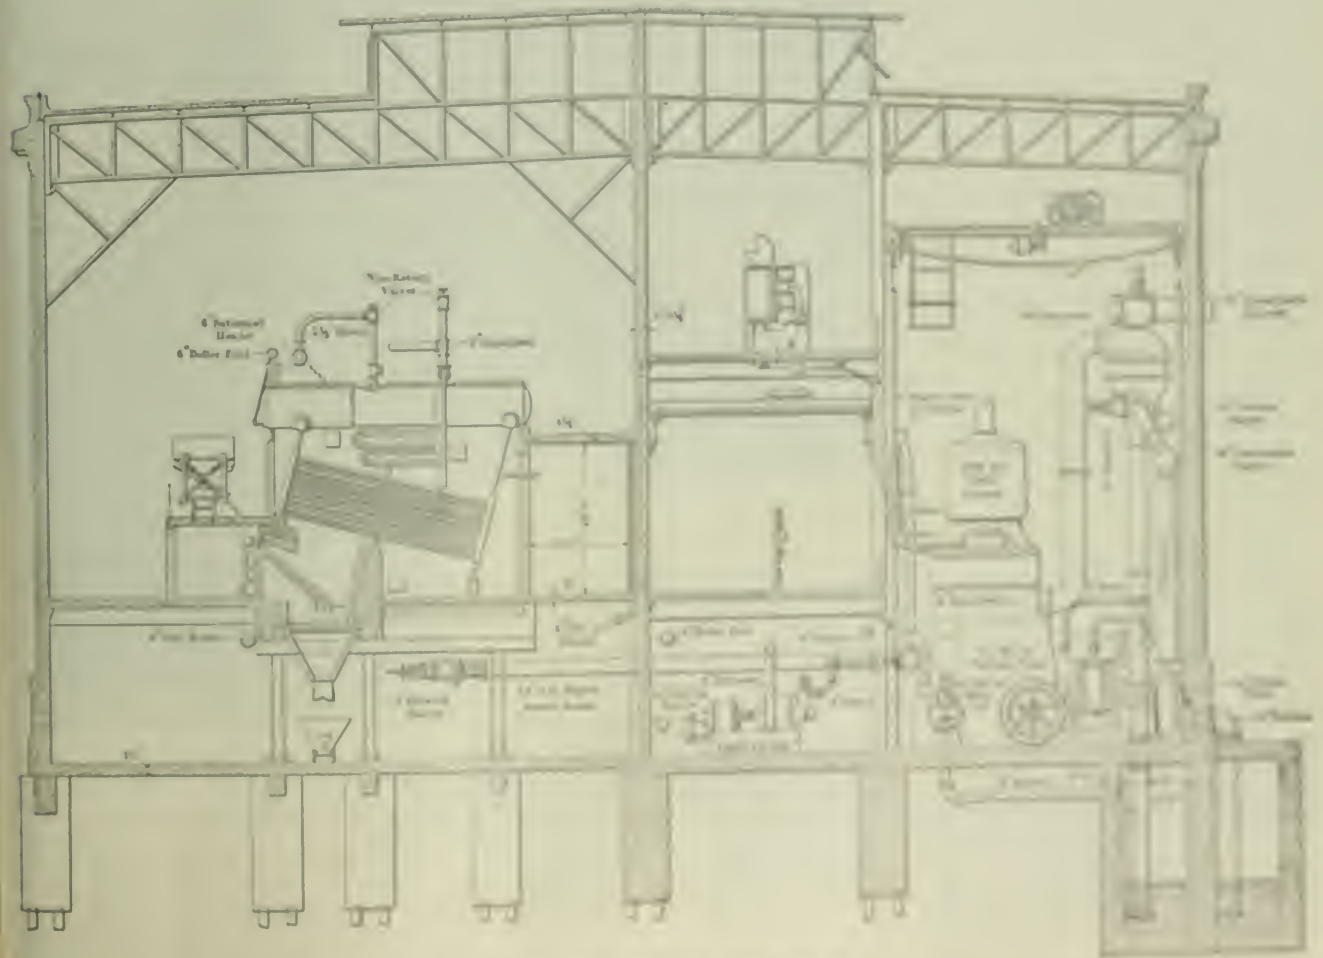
INTERNAL LAYOUT OF POWER PLANT
